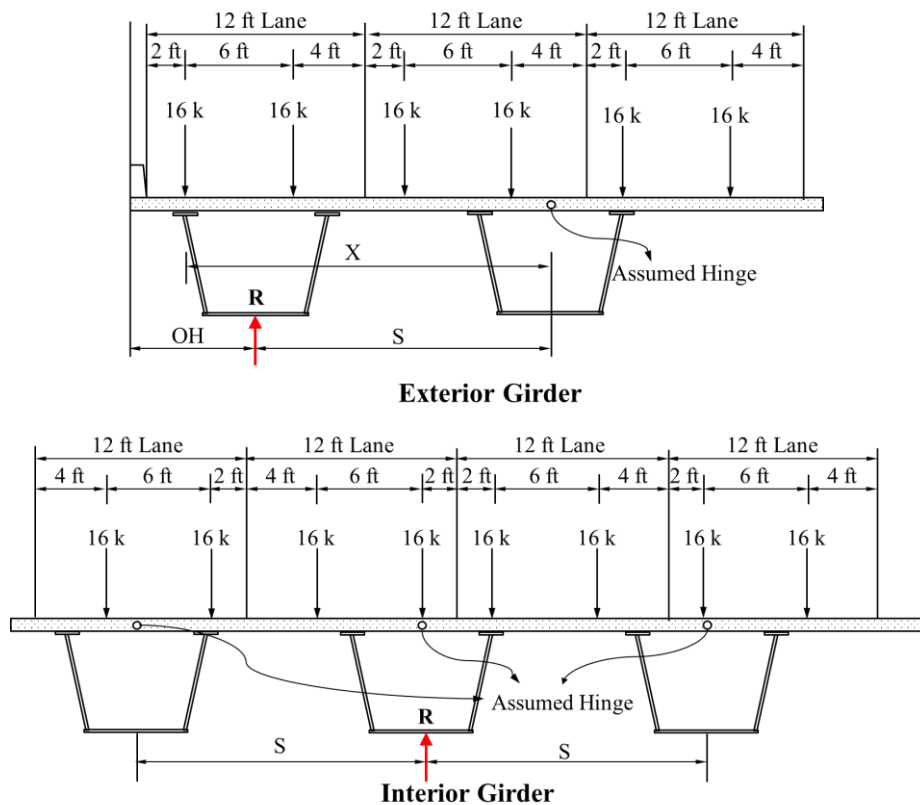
Lever Rule for Exterior or Interior Girder in Tub Girder System
